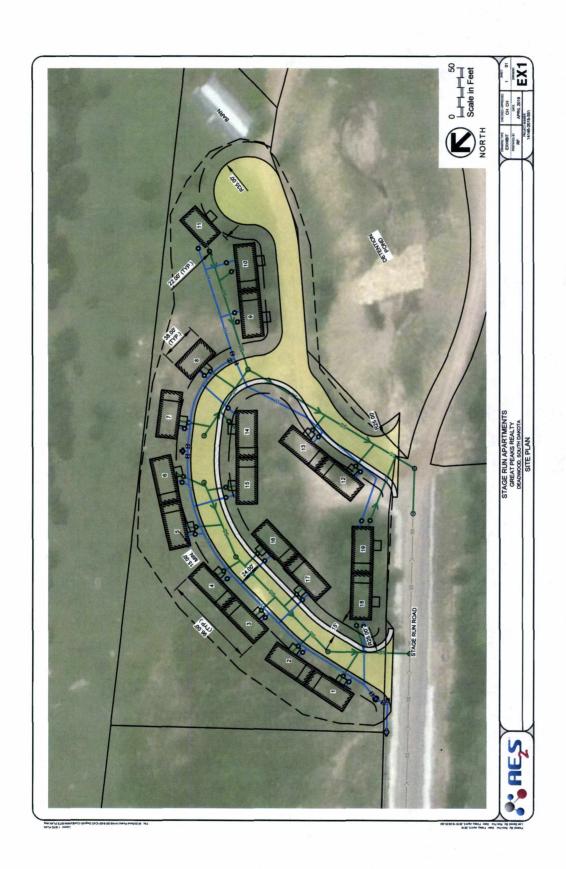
Stage Run Apartment Site Plan and Improvements
